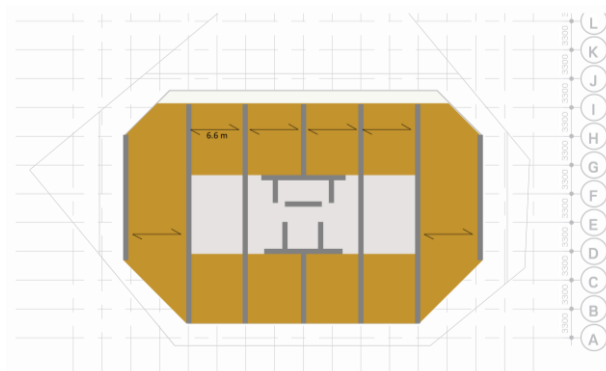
Floorplan hybrid design variant. Adapted from personal communication R. Crielaard, September 9, 2021.
